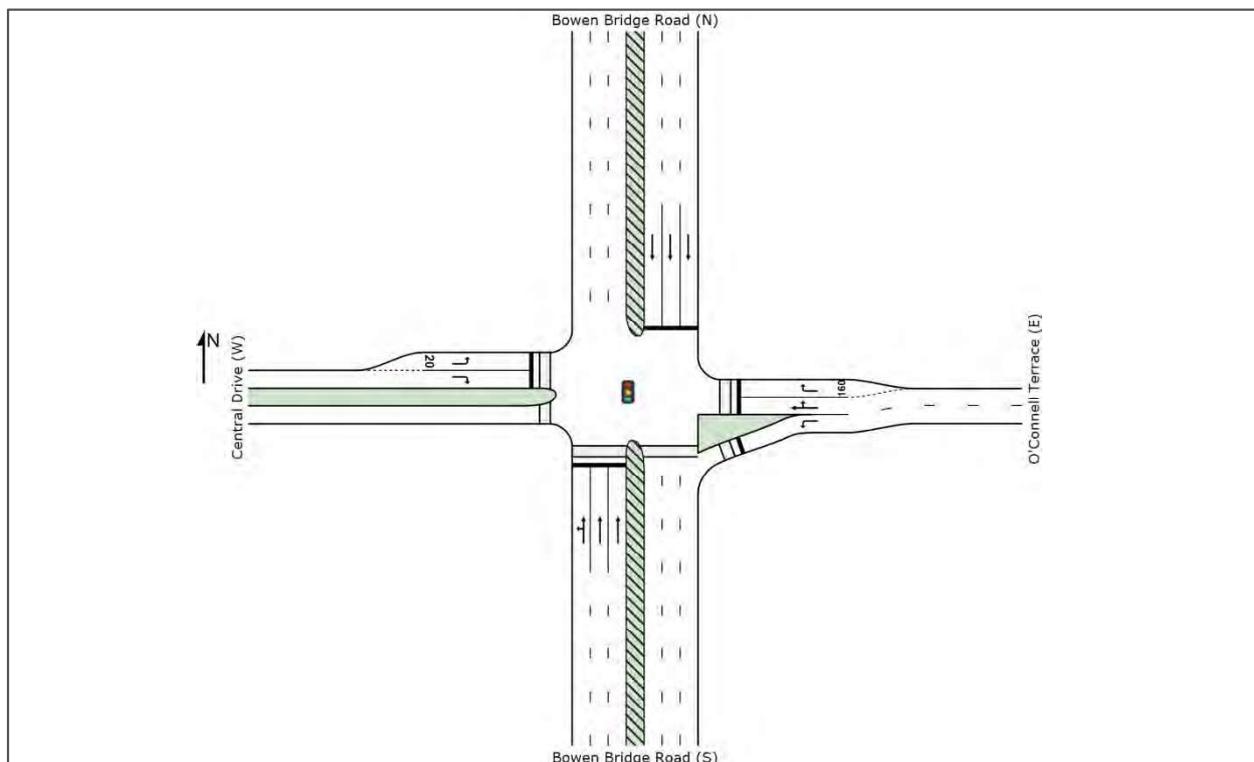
Assessed SIDRA Layout – Intersection 5 – Upgraded Configuration
